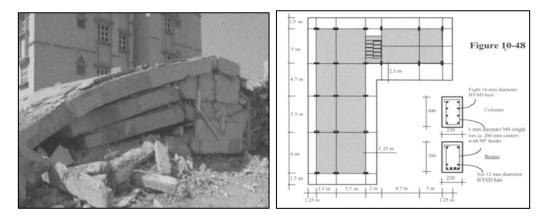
Collapsed of an L-shaped school building in Ahmadabad. Columns had no ductile detailing. Notice orientation of 230mm wide columns in long wing; small resistance to deformation in long direction.
